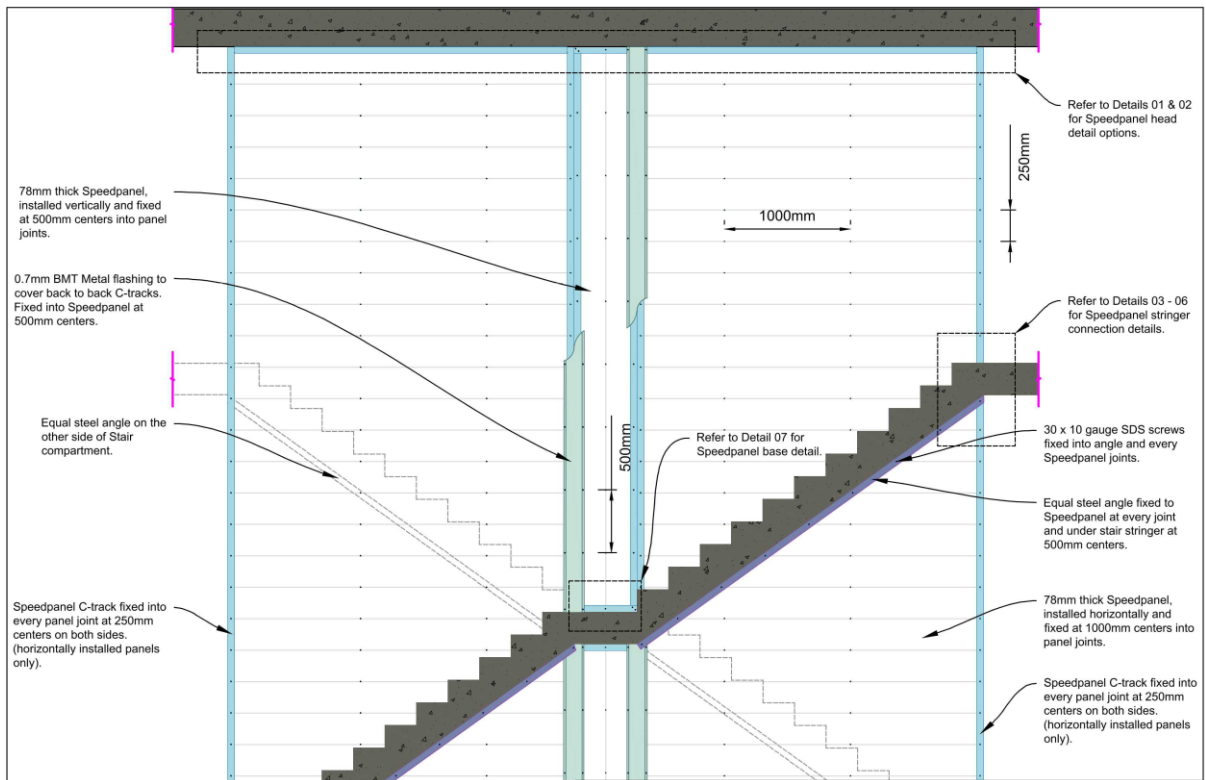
A- Dual stack scissor stair Elevation view (Speedpanel without cladding)
